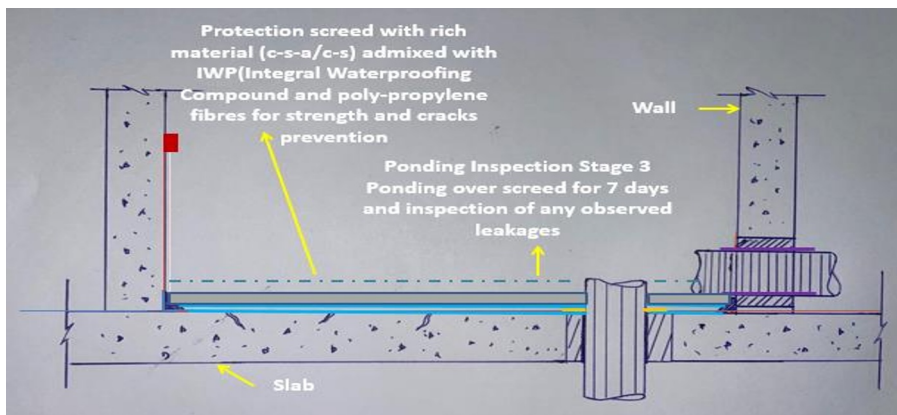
c Sectional Drawing for Typical Toilet Waterproofing
